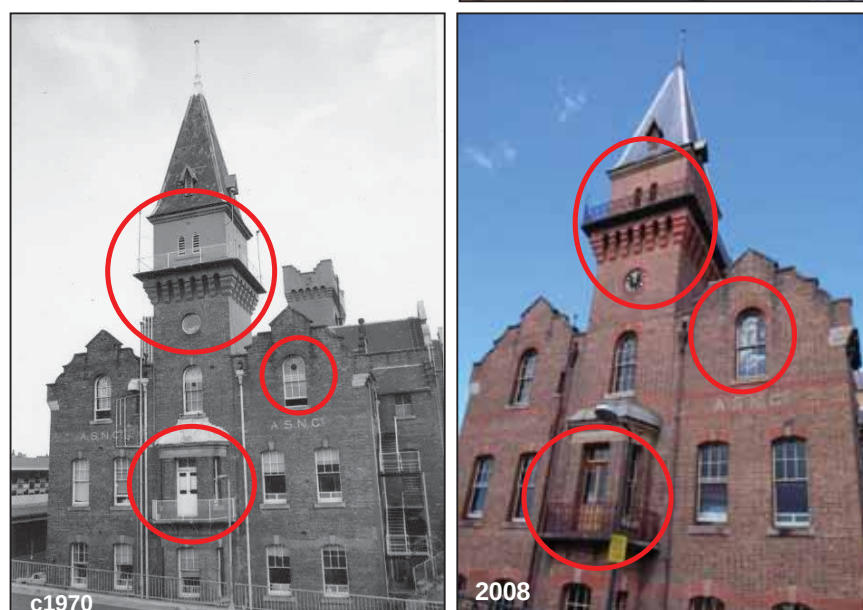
Note new period balcony railing replaced to bay windows and door and clocktower balcony during 1990s restoration, new clock, changes to downpipe colouring and paint scheme and removal of render from upper half of tower. (Source: Historic photo from Foreshore Authority, undated 38942_HIM 21 – ordinance Stores n.d.)
